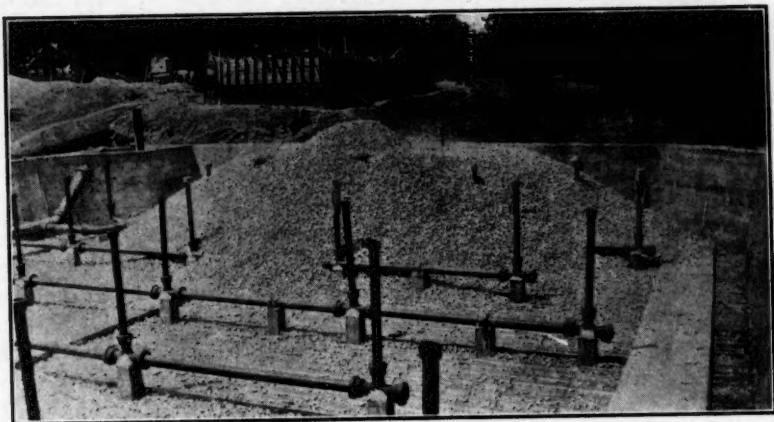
CONSTRUCTION OF SPRINKLING FILTER, STROUD, OKLA.
